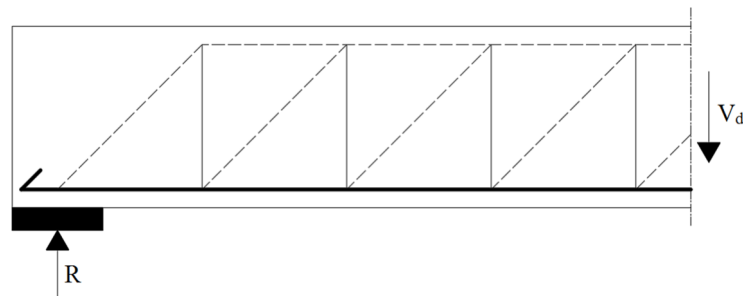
Truss model for RC beam with shear reinforcement. Dashed lines indicate compressive struts and full lines indicate tensile ties.
